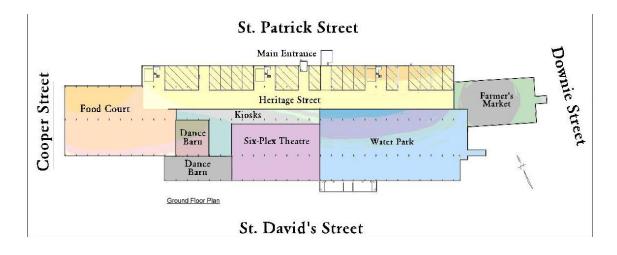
Concept floor plan for Ryan's Railway Centre (from Exhibit 23 at p. 18)
